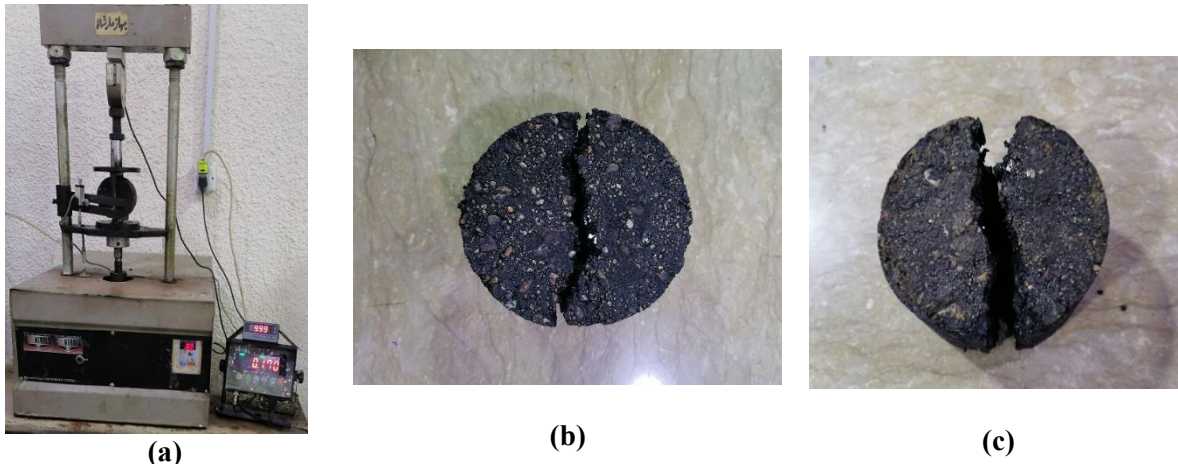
Indirect Tensile Cracking Test: (a)testing machine, (b-c) specimen after testing
